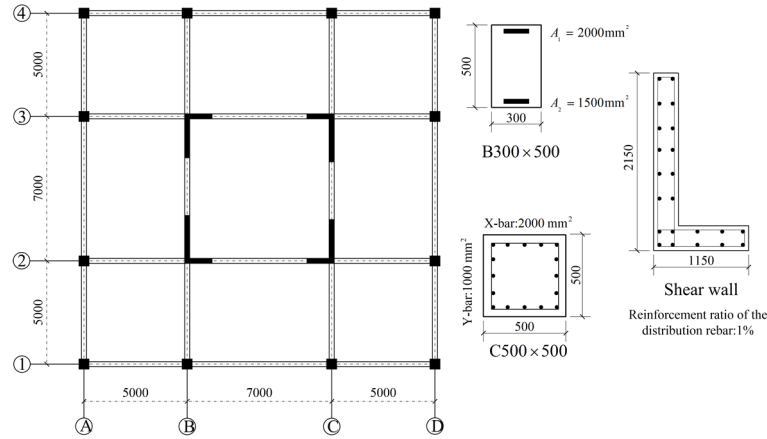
The geometric configuration and reinforcement information of a 13-storey frame-shear wall structure
